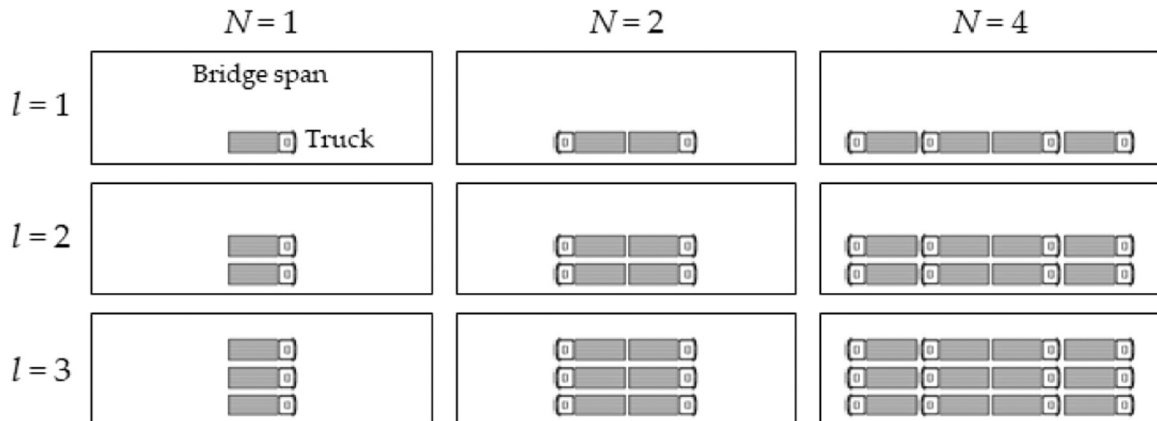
Common truck layouts over a bridge deck for proof load tests.
